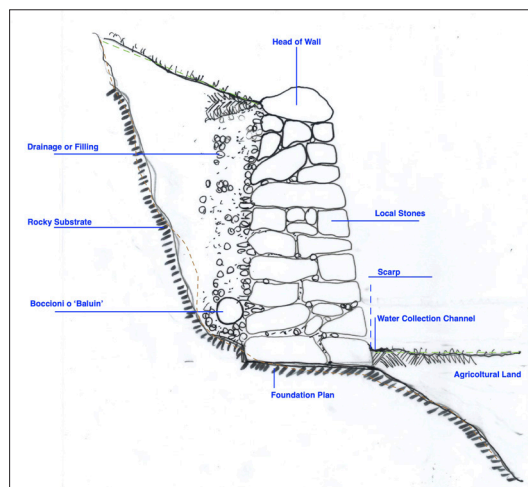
Components of a Dry Stone Wall. Sketch by Patrizia Burlando - 2025
